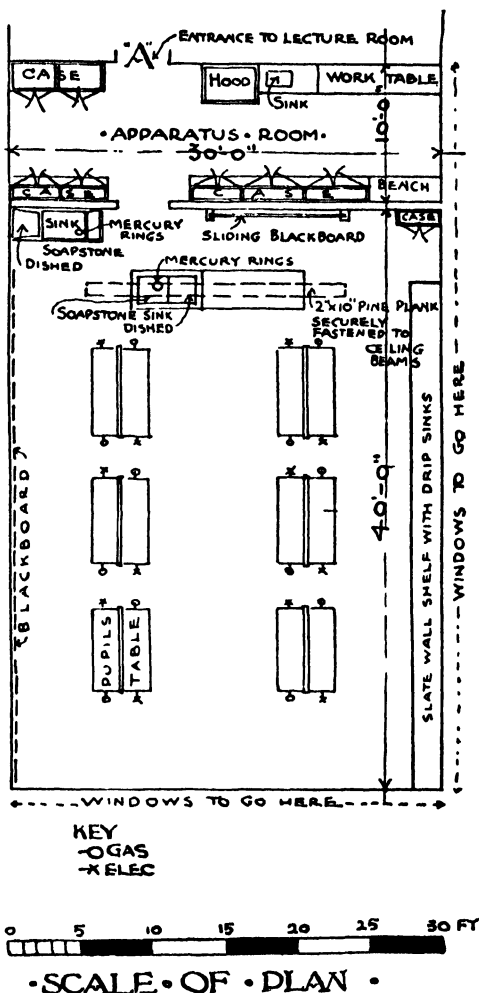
Physical Laboratory Plan, School House Department, Boston.
